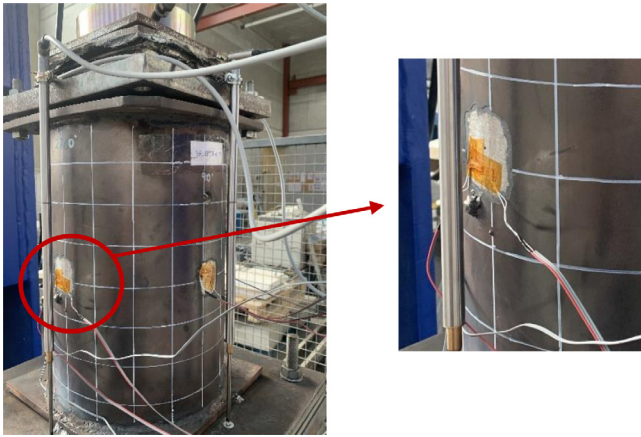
Detailed view of the strain gauges attached to the outer steel tube surface.
